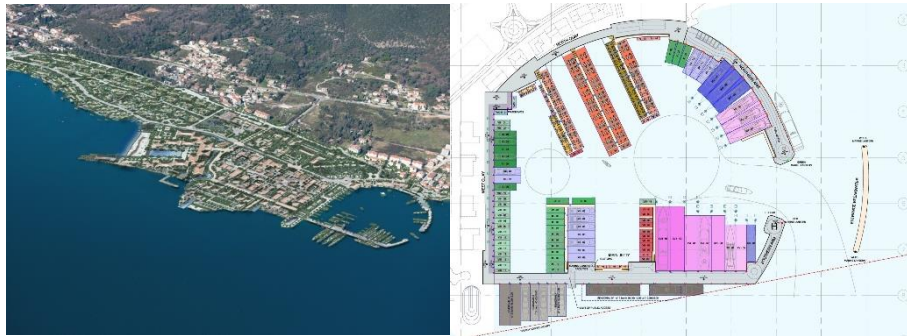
Portonovi resort: Masterplan and Berth arrangement
